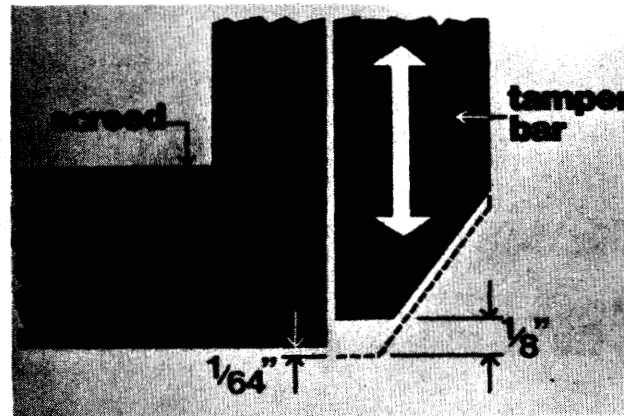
Tamping Bar (1. in. = 25mm).
